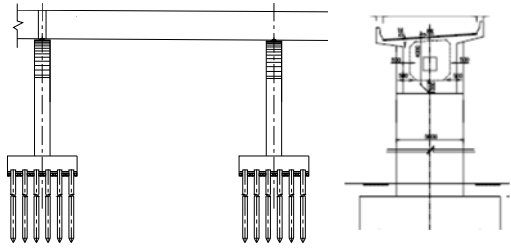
Typical Cross Section of Approach Section (Preparatory Survey)
